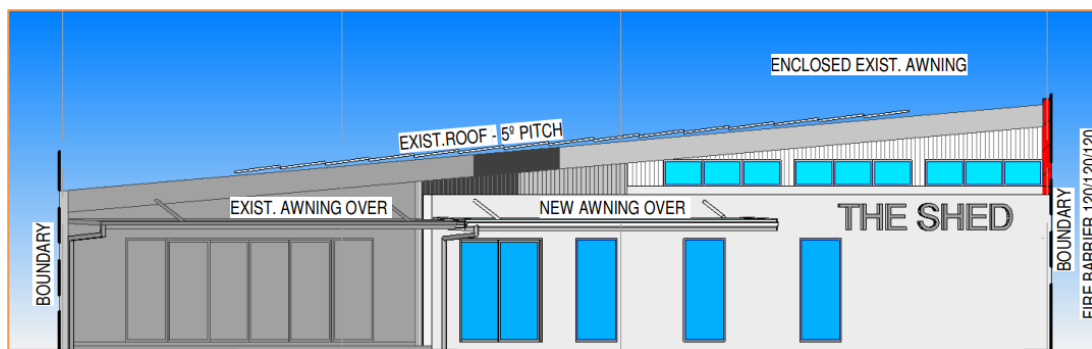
Elevation viewing from Little Drysdale Street Source: Burdekin Building Design.
